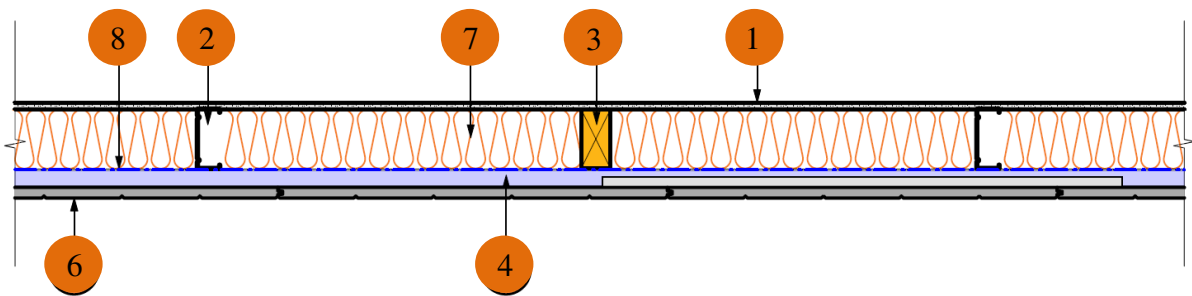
Vertical UBIQ INEX>EXPRESS Wall System Steel or Timber Frame – Plan Section
